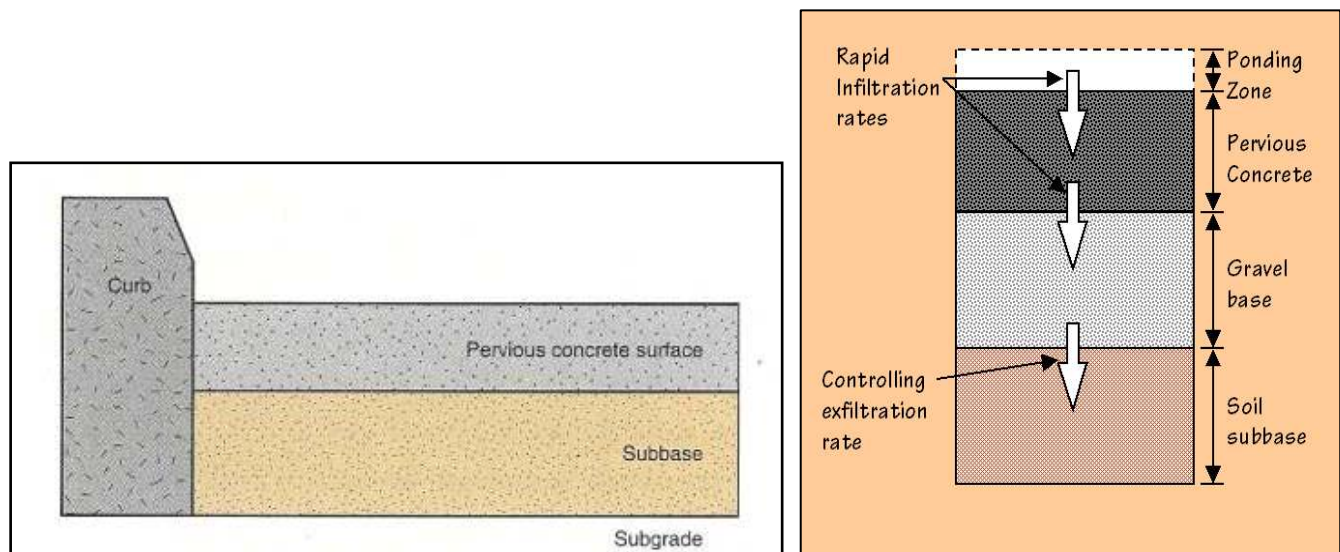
Example cross-section of a pervious concrete pavement system. Curbs (on both sides) will increase the storage capacity.
